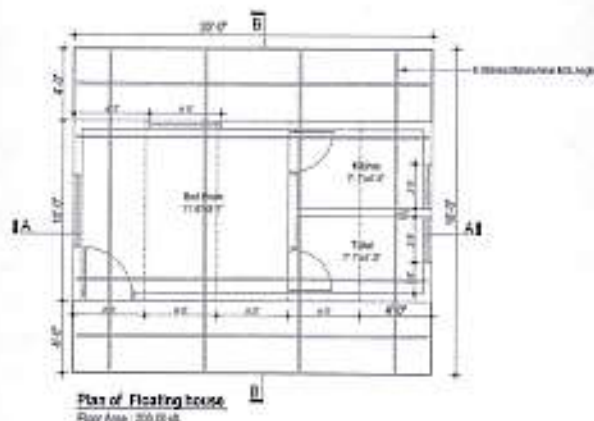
FLOOR PLAN OF THE PILOT PROJECT
